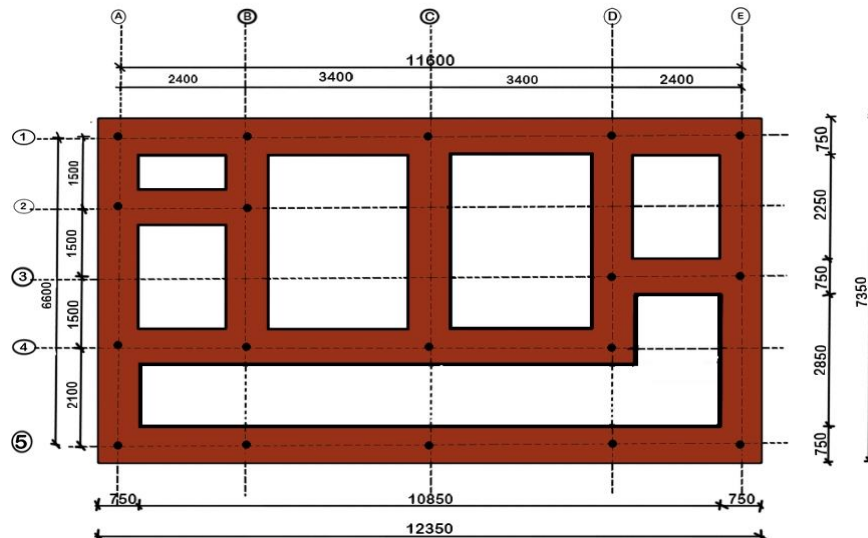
Trench plan with location of reinforcement bars marked
